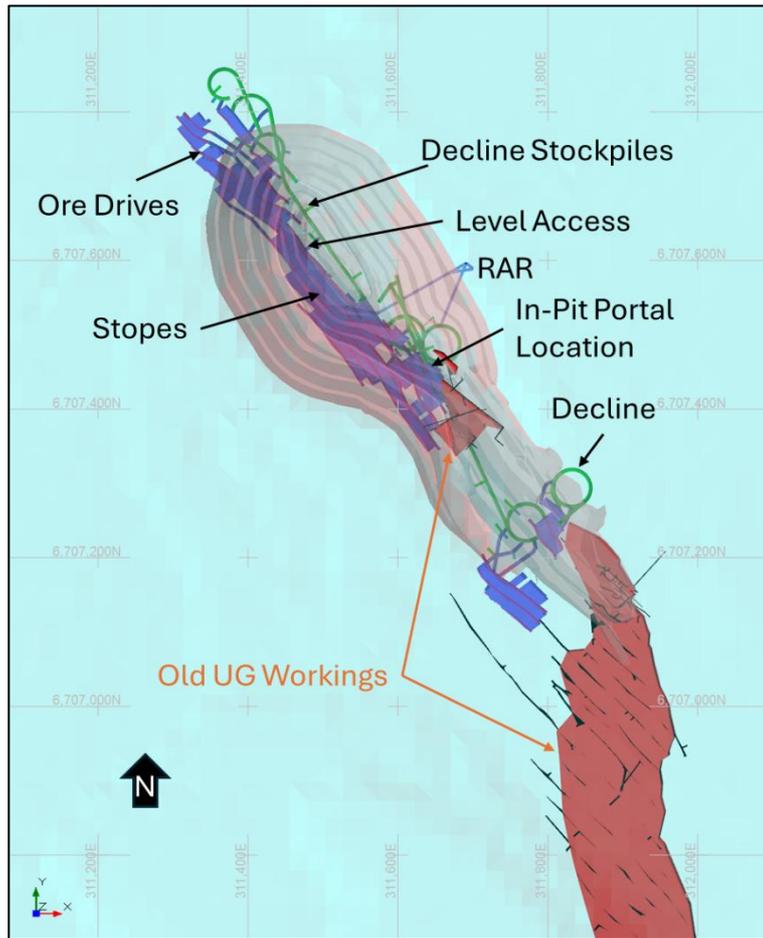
Yunndaga UG concept design (plan view) with existing workings shown
